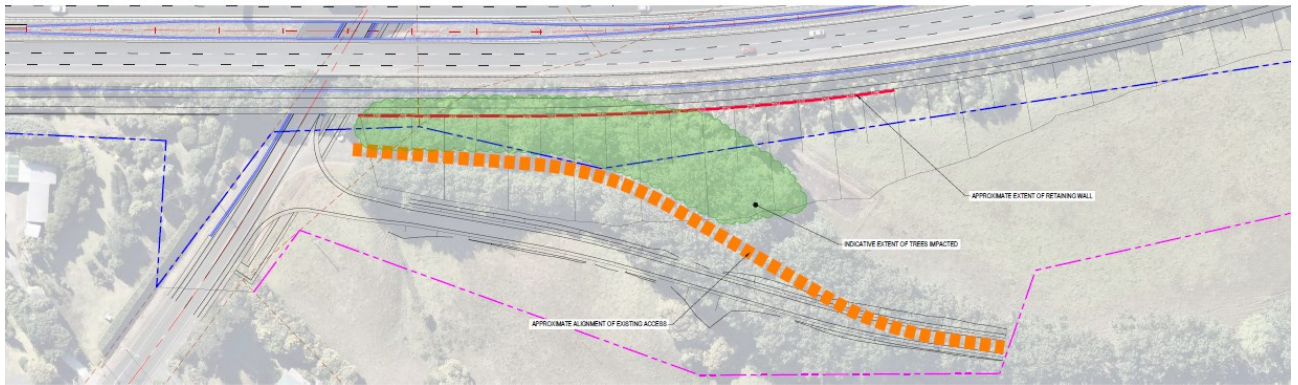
St Stephens School – Retaining Wall (Option Two)
